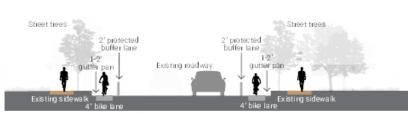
Fergus Falls GET: On-Road Two-Side Typical Section
